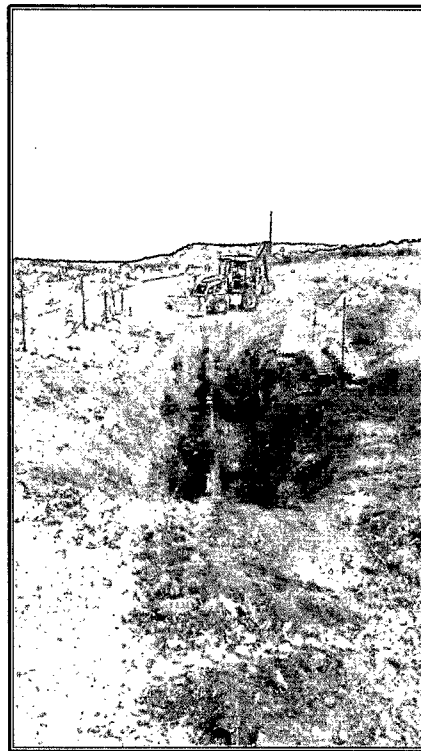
View of Lateral O-17 pipeline excavation at its fullest extent.
